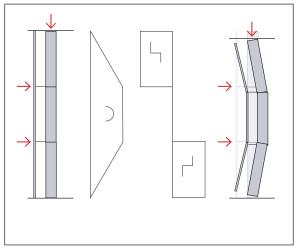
schematic overview of forces acting on the façade system, including global deformation
